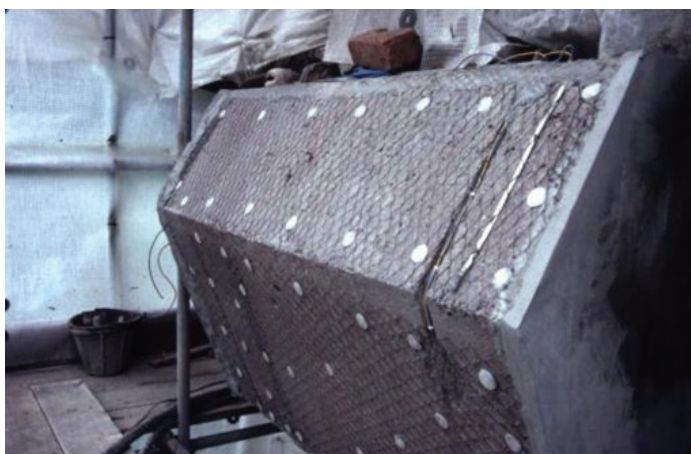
Activated mesh anode fixed on the steel reinforced concrete element prior to the application of a cementitious overlay
